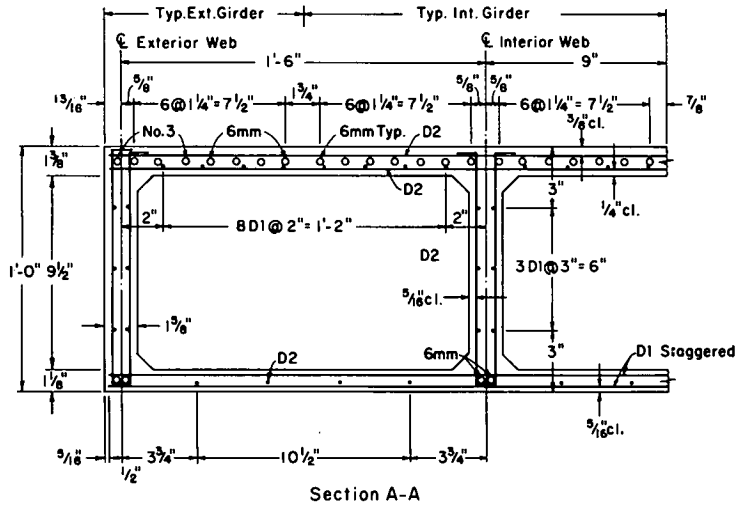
Section of Girders Near Bent Cap of Specimen DC-9
